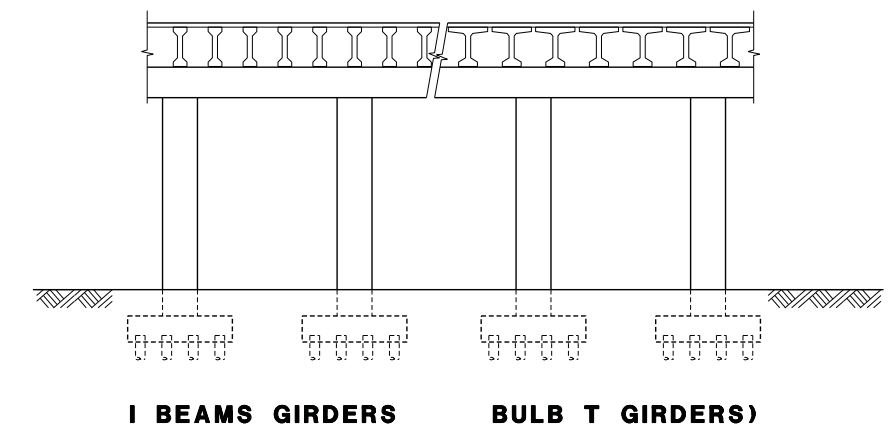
Typical Section for PC/PS I or Bulb T Girder Structure
